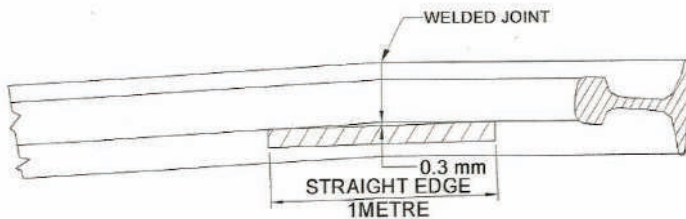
(b) Tolerance for Lateral Misalignment of Welded Joint with New Rails
